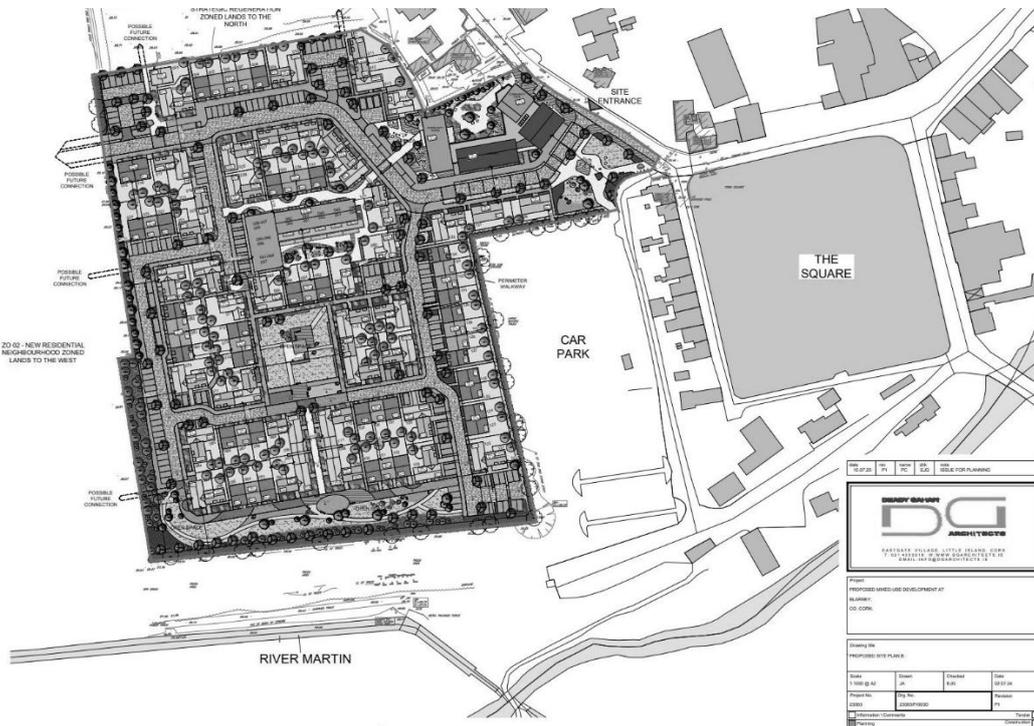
Site Layout Map (c: Deady Gahan Architects)
